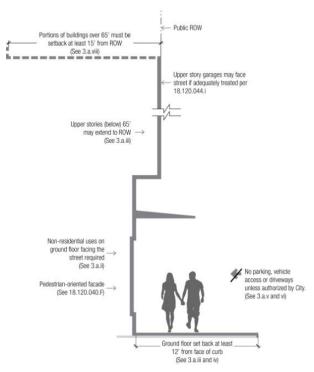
a. Summary of requirements for building facades facing a Type A Pedestrian Oriented Street. (This diagram is for illustrative purposed only. See Section 18.120.020.3 for stated requirements.)
